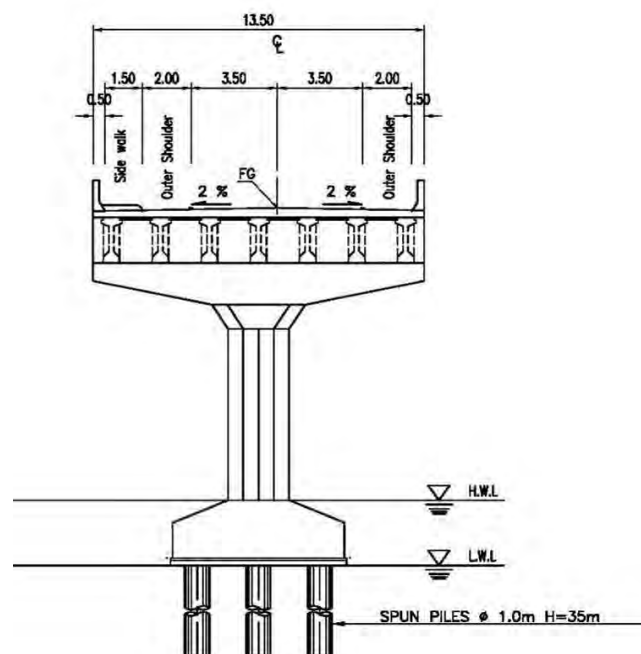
Typical cross section of Bridge and Pier for Phase 1 of North Kalibaru
